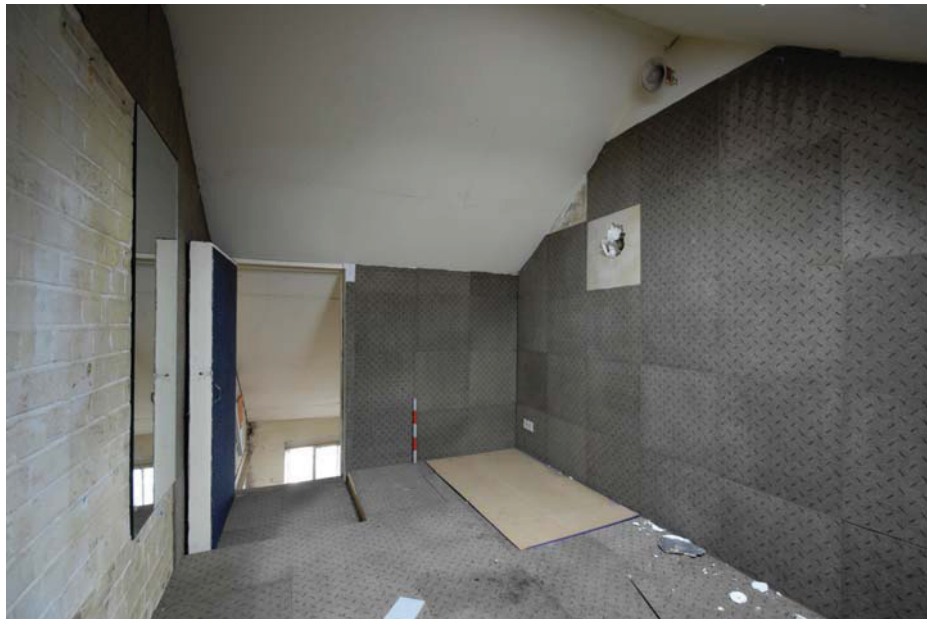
Internal view of Building 4, Stables, view of mezzanine floor, looking south
